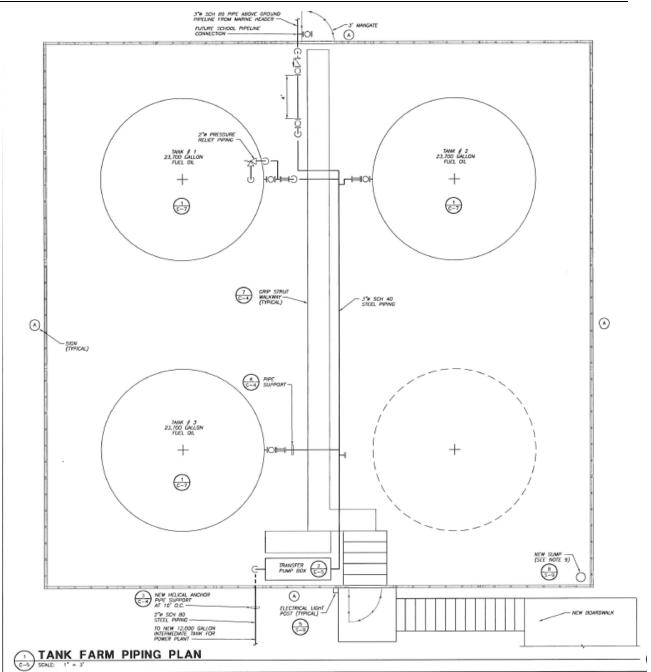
Kwigillingok Powerhouse Bulk Fuel Facility Tank Layout
